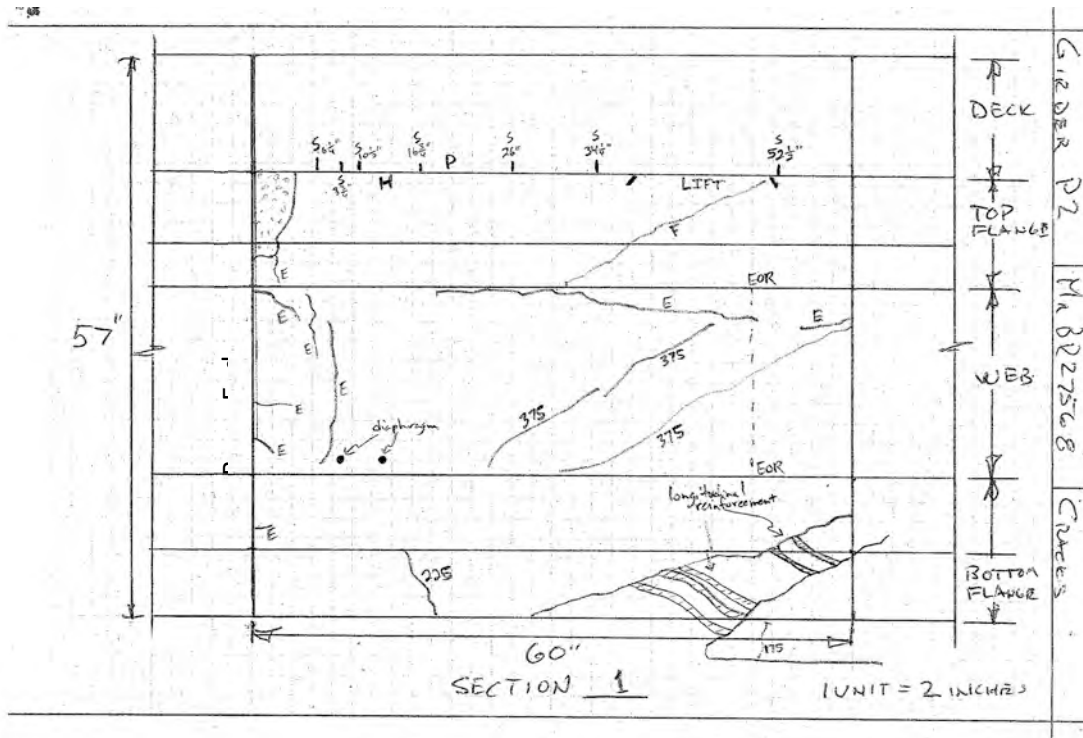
Girder P2 crack pattern – Section 1 (See Figure 3.4 for Section limits)
